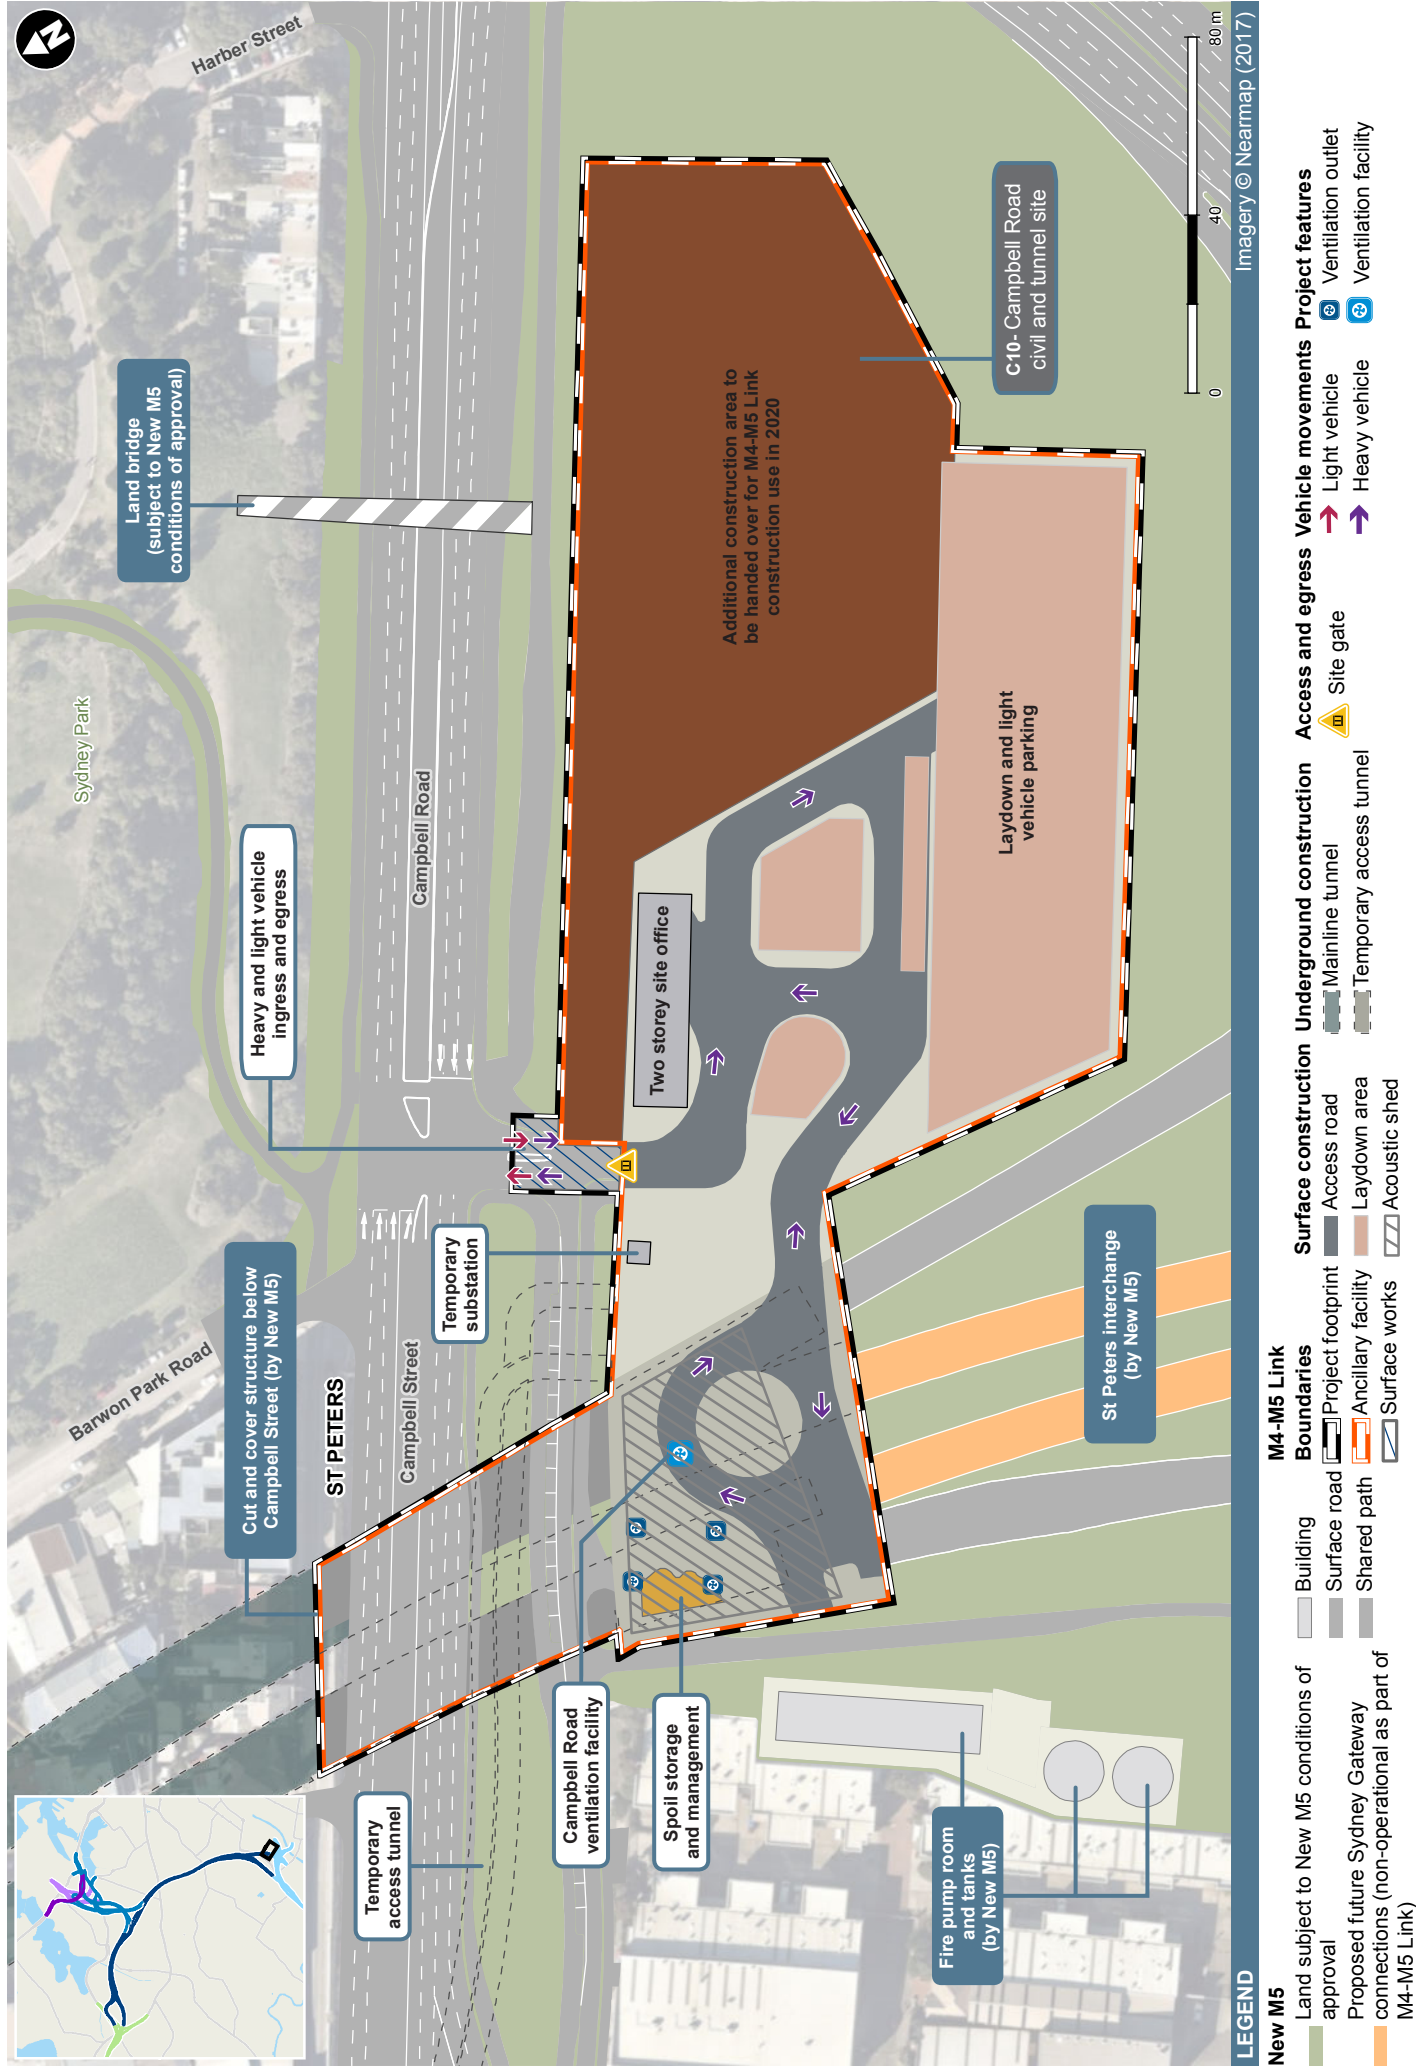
Indicative Campbell Road civil and tunnel site (C10) layout
